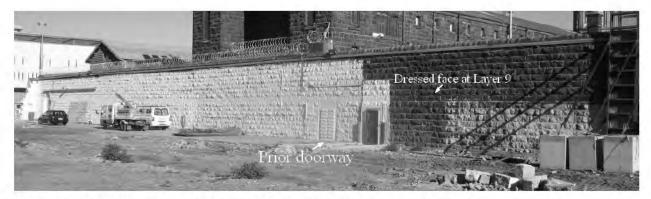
Remaining section of the South (heritage) Wall to the west of the wall section that was removed
